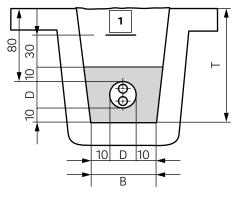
Trench cross-section of RAUVIPEX pipe
